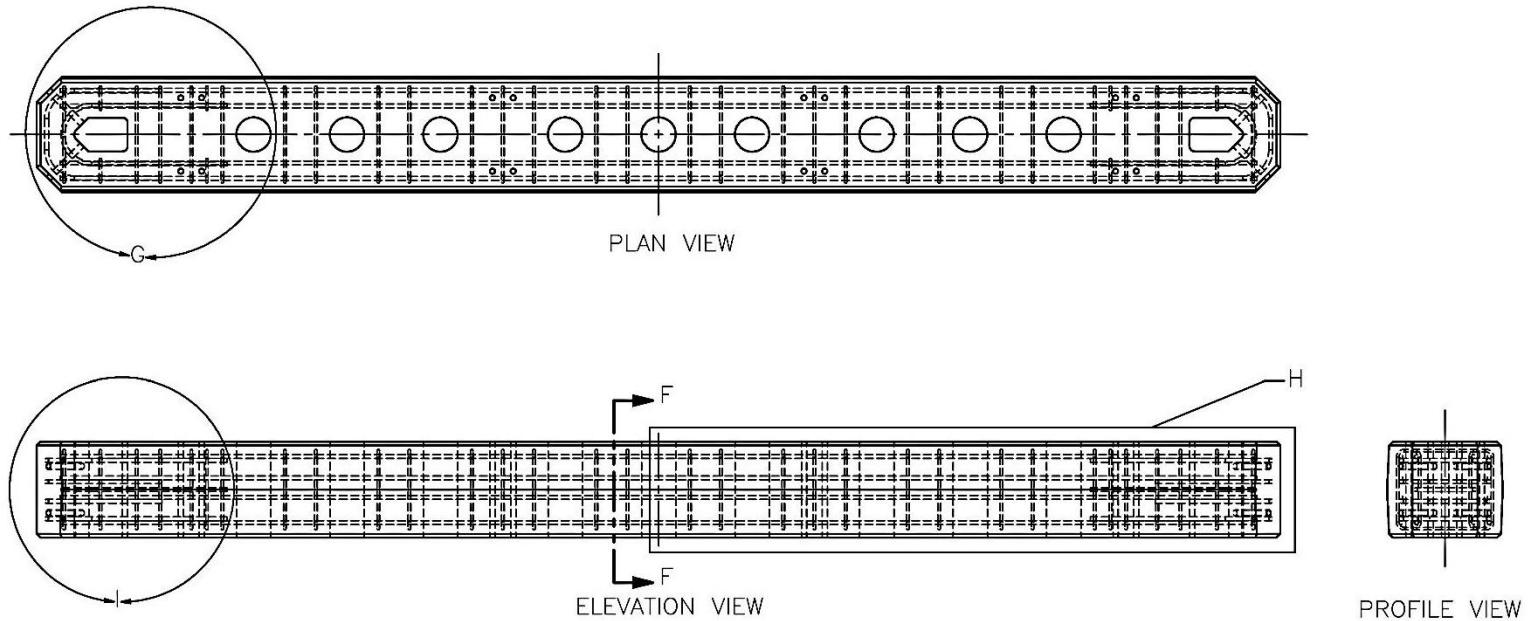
Concrete Beam Details, Test Nos. SFH-1 and SFH-2
